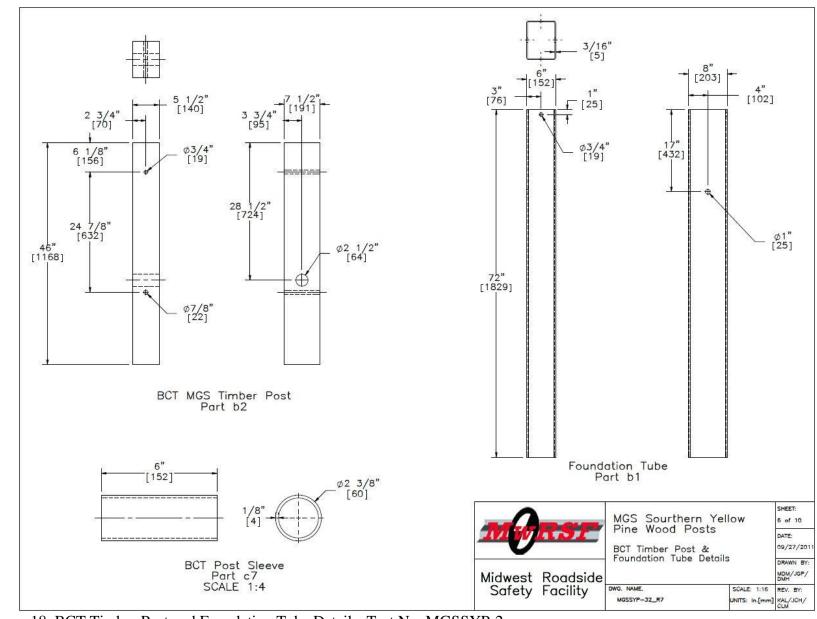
BCT Timber Post and Foundation Tube Details, Test No. MGSSYP-2
